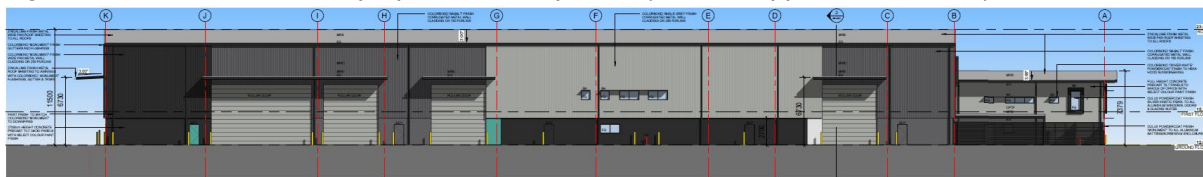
Northern elevation of proposed development. (Source: Applicant's material)
